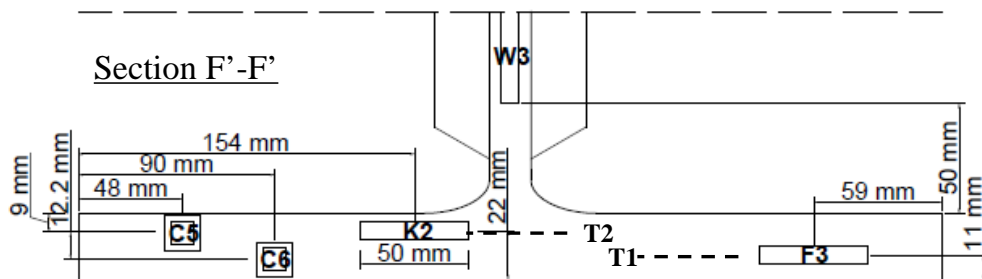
(Continued): Plan view and cross sections of gouged column flange / web showing locations of CVN specimens
